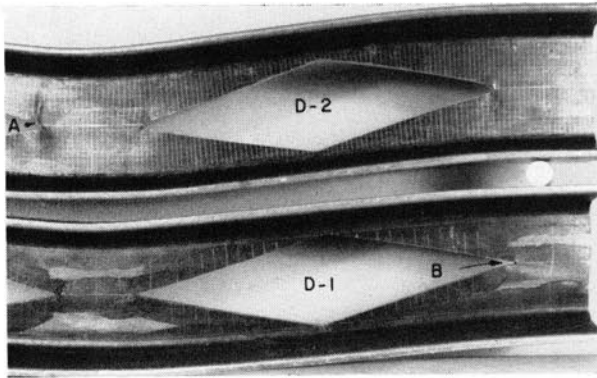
3-in. I-Beam Failures Under Center Loading, Diamond-Shape Cutout
